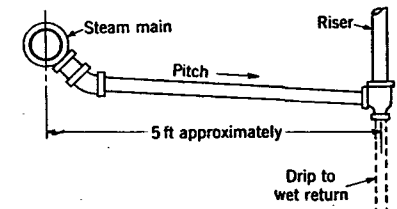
TYPICAL STEAM RUNOUT WHERE RISERS ARE DRIPPED
